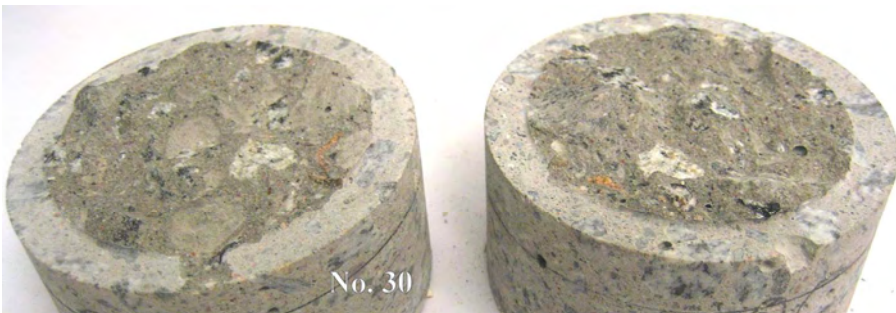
Photograph showing the failure surface for test No. 30 after fatigue test.
